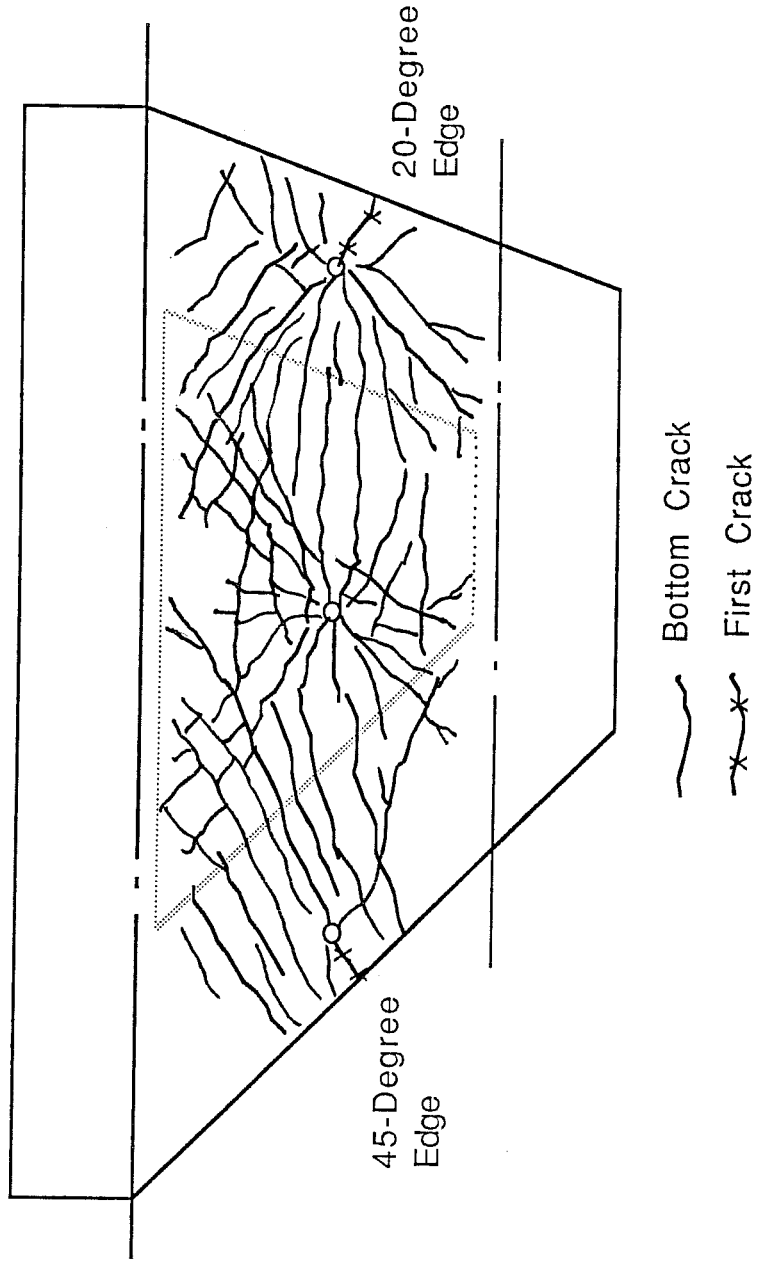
Final cracking pattern on bottom surface after tests to failure
